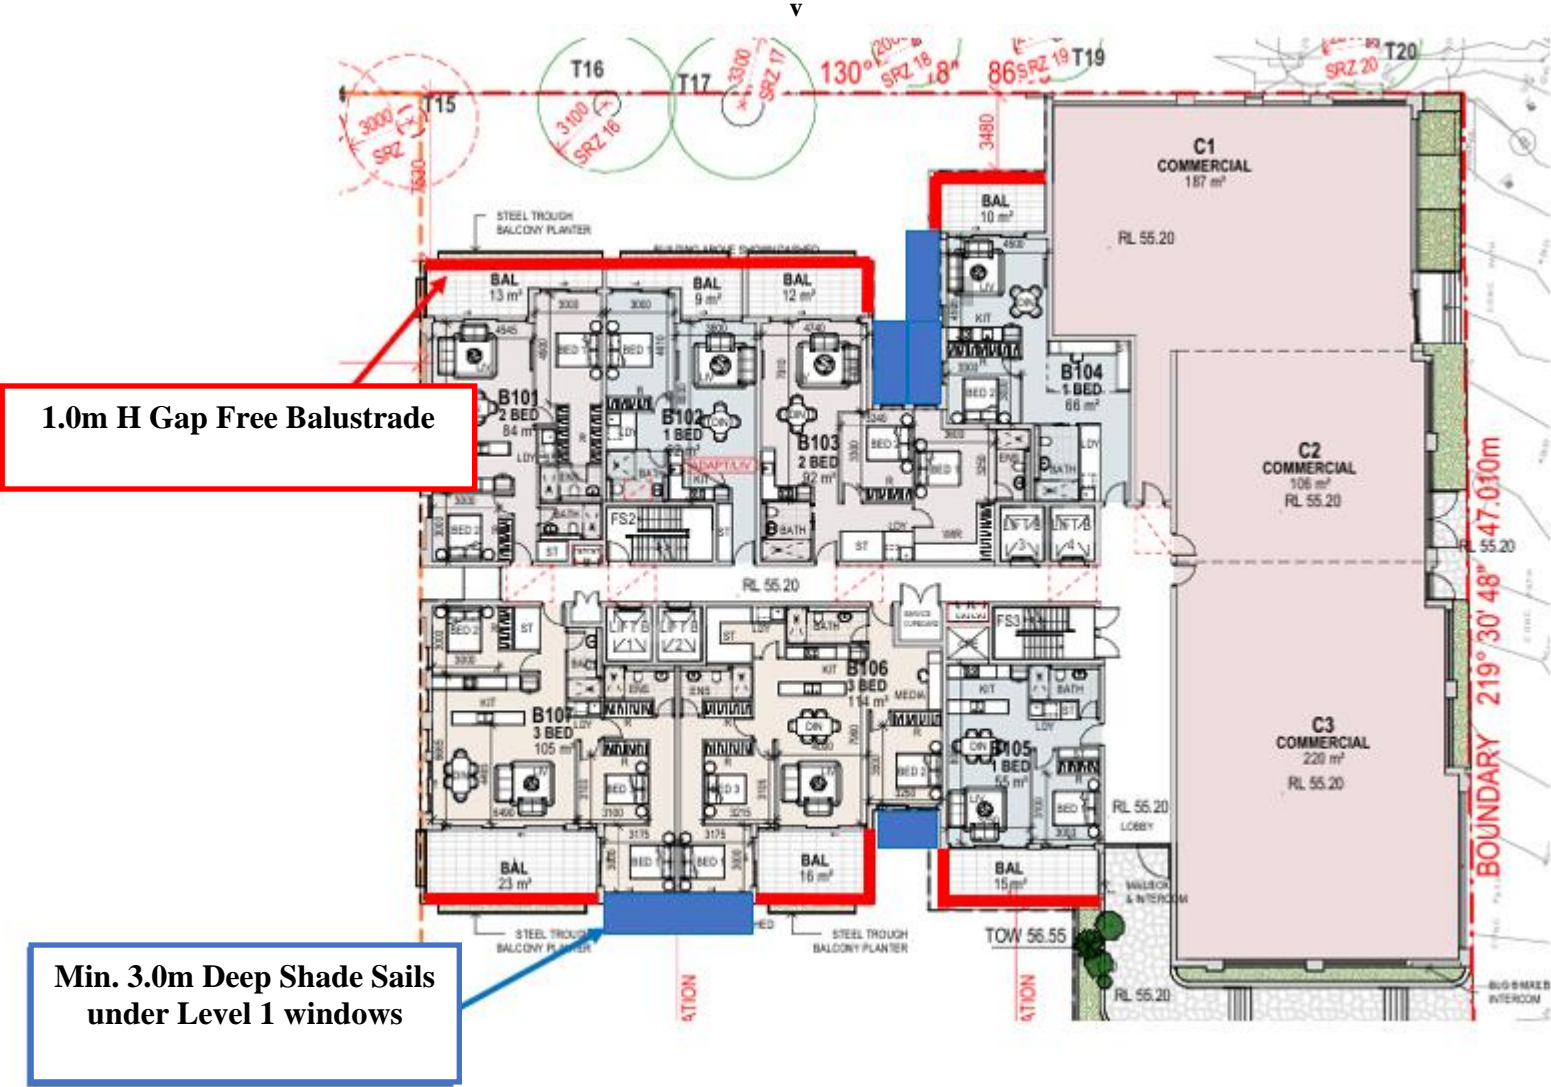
Proposed Sound Barrier Locations & Shade Sail Location - Level 1
